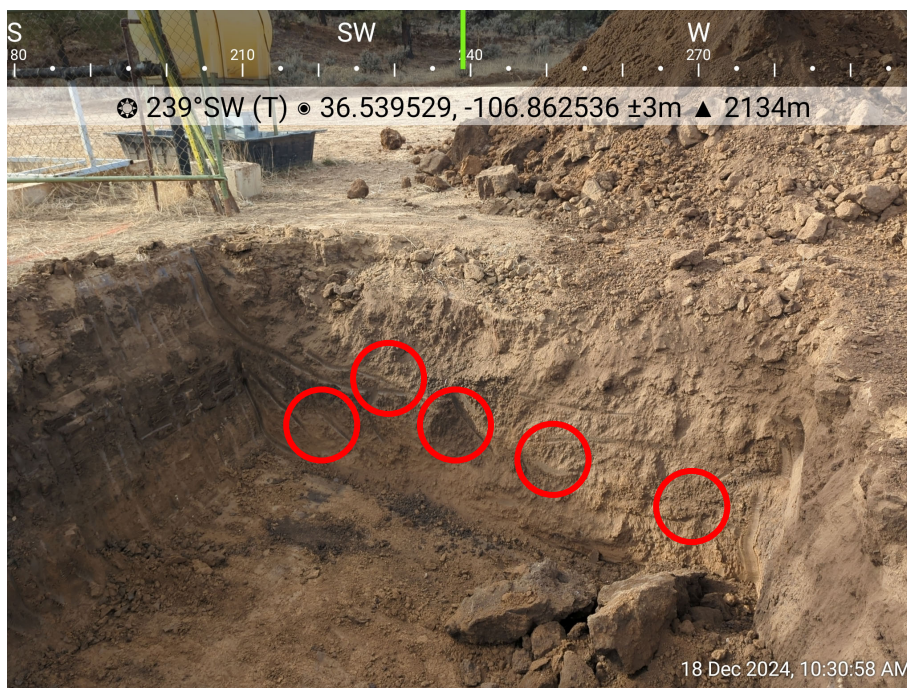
SS03 collected as a 5-point composite sample from the west sidewall of wellhead excavation area.
